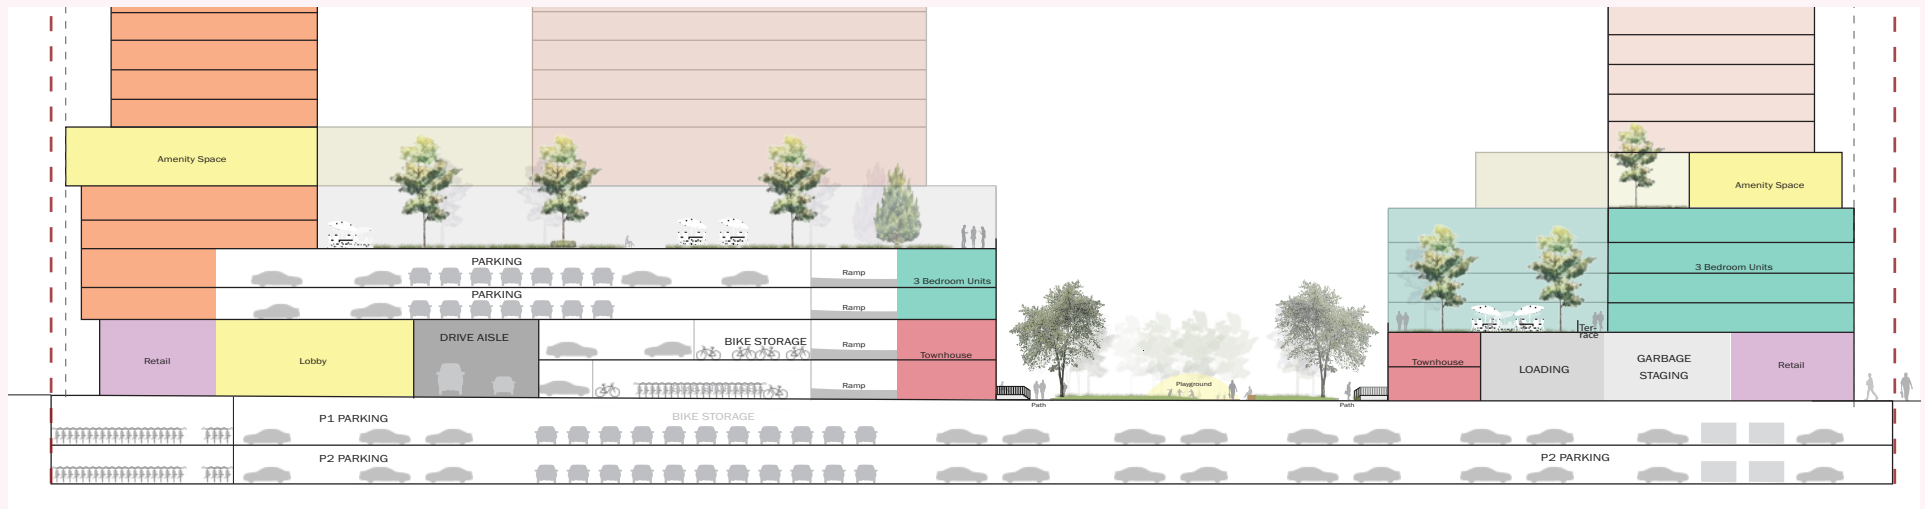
The above-grade parking structure and servicing in this proposed development is wrapped in active uses to minimize its impact on the street.
